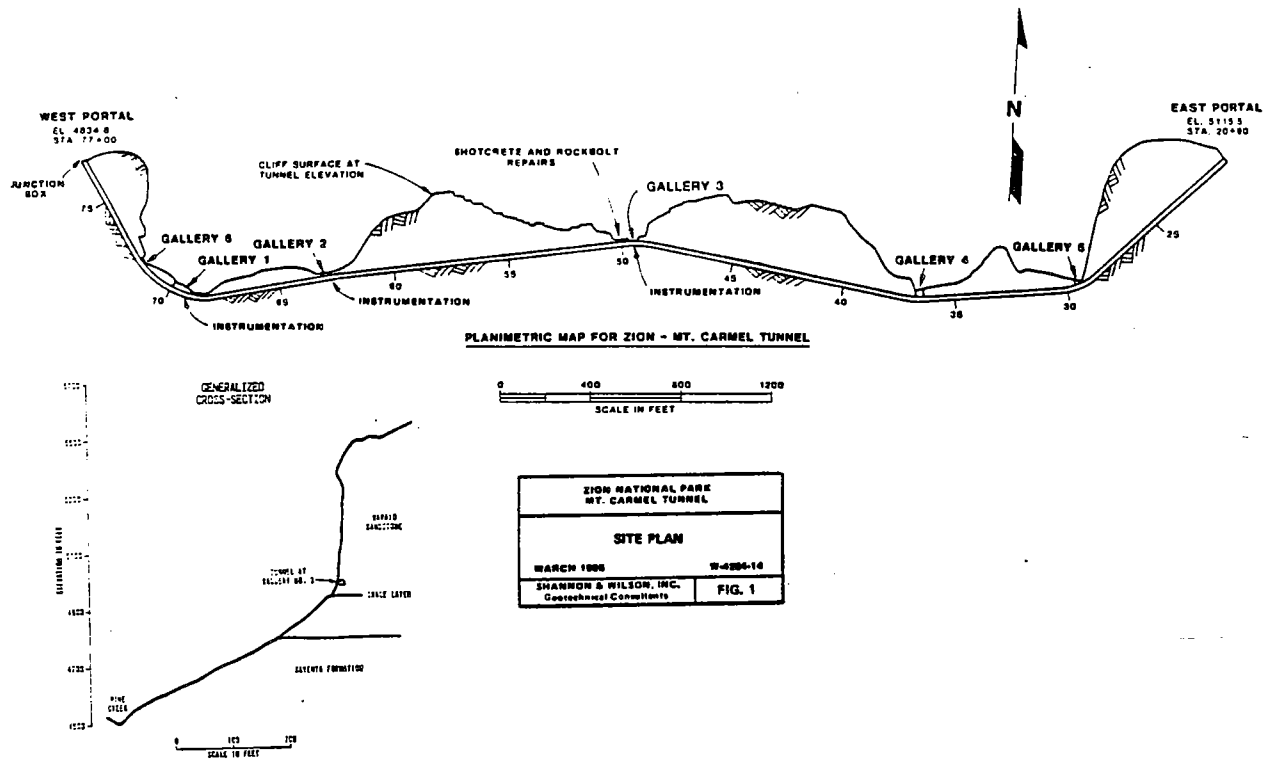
Planimetric and cross-sectional views of Mt. Carmel Tunnel, from Robinson (1980).
